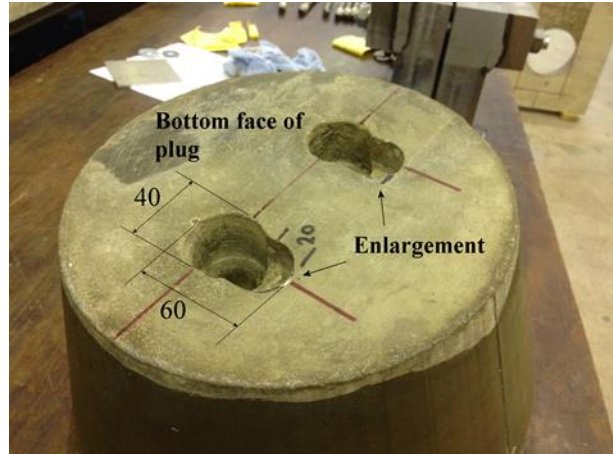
Lower face of reinforced concrete plug showing extra enlargement for bolt hole
